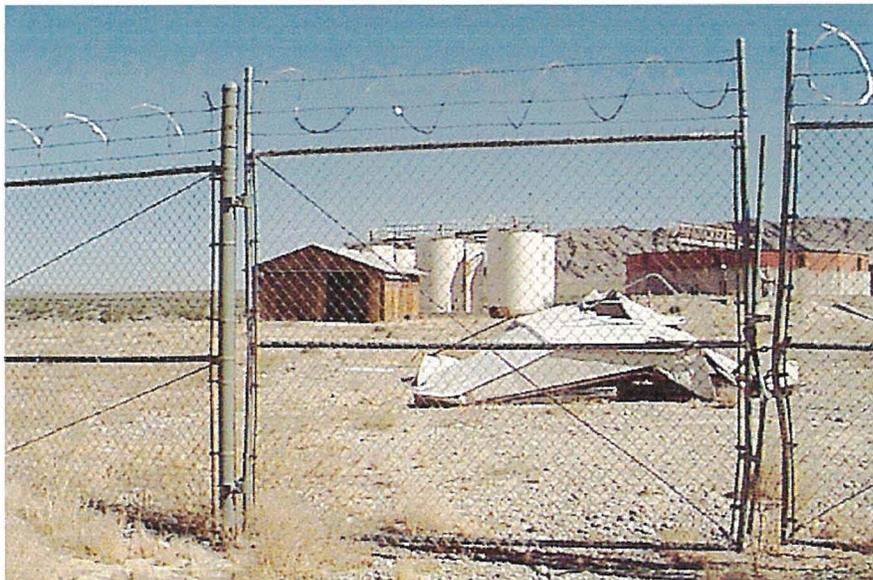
Taken by E. Seum on 7/15/98. Taken looking north. Shows small building and collapsed metal building on Advance #5, and mixing and thickener tanks on the Advance #4 mill site.
